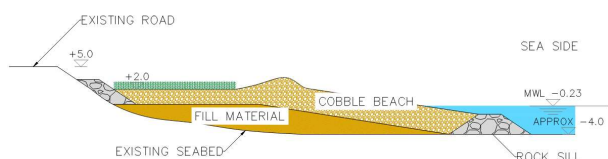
Cross-section of the proposed conceptual cobble revetment.
